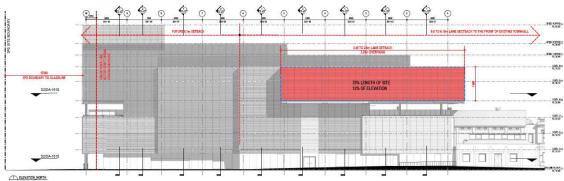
Northern Elevation showing laneway overhang as proportion of façade (Source: extract of DA-1610)
